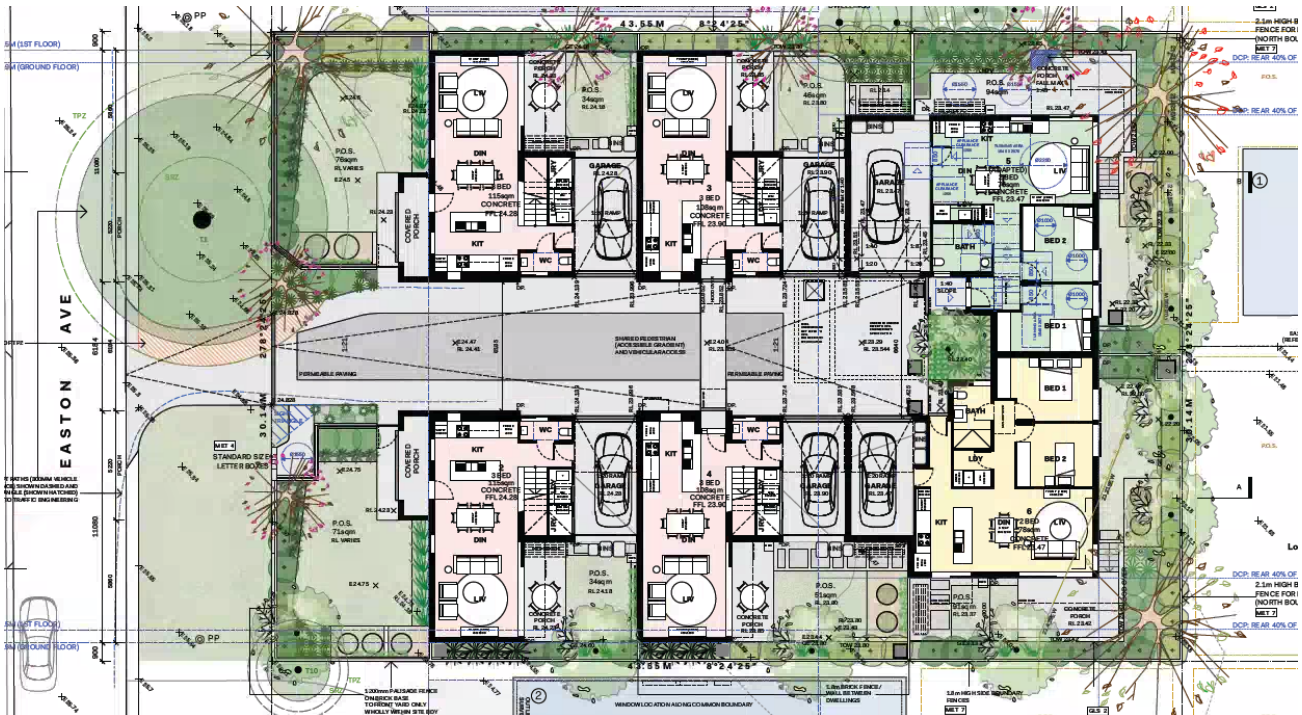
Extract from Architectural Plans (ground floor) (Source – Carter Williamson, dated 10/01/2023)
